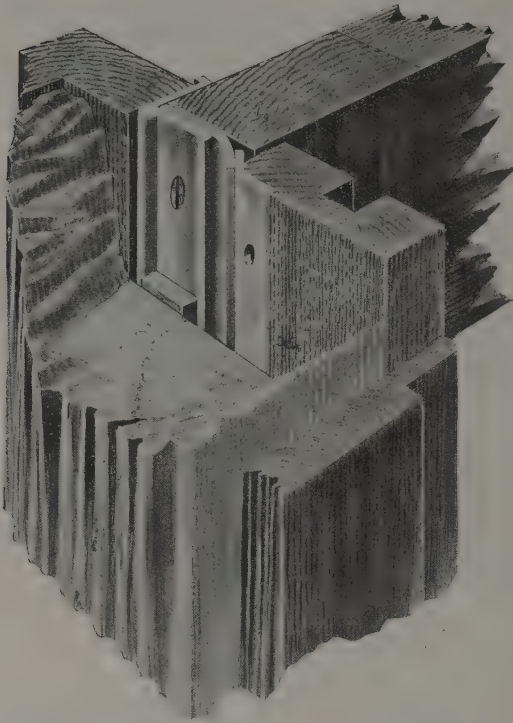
Universal Side Weather Stripping, Standard Design.
